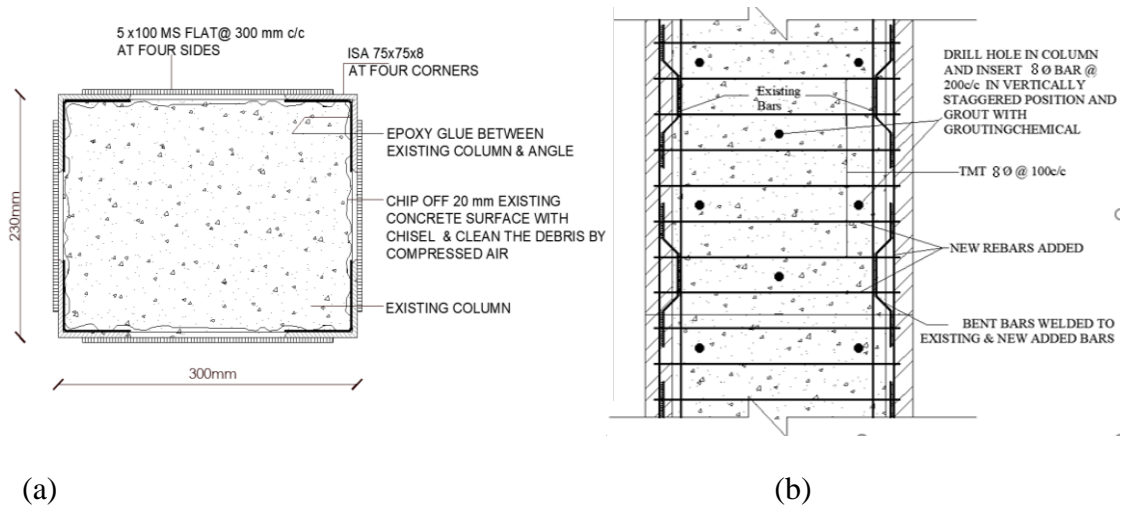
Retrofitting detail of column (a- typical plan, b-typical section)
